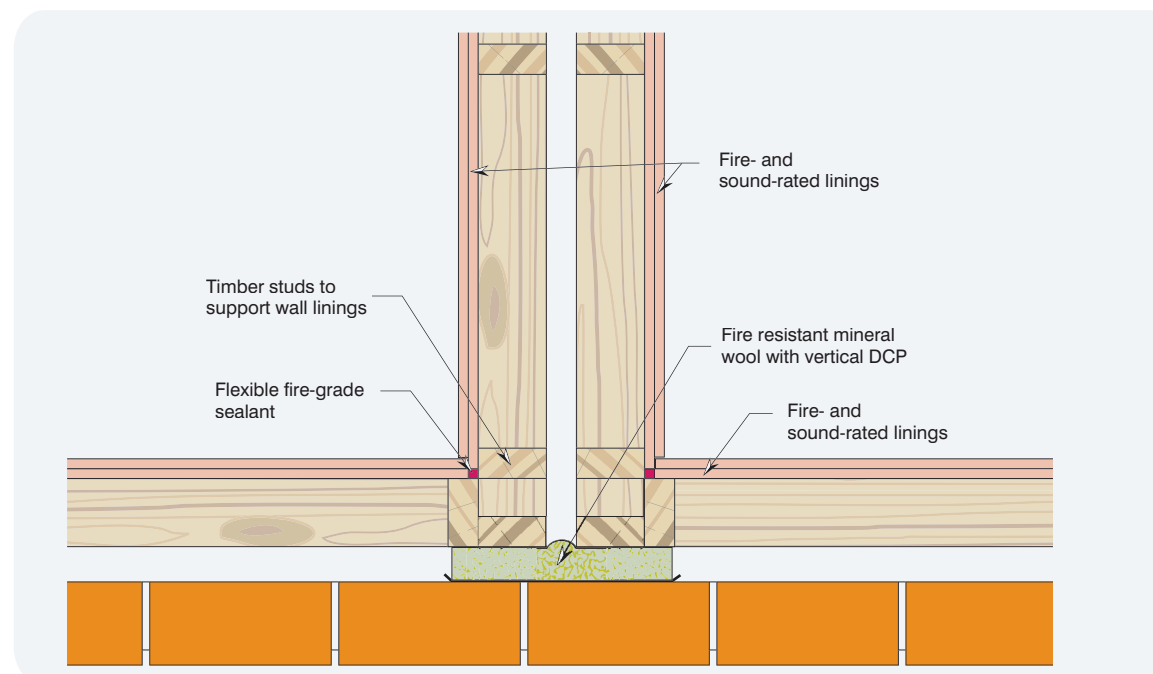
Typical junction of elements with the same FRL – fire-rated bounding wall abutting fire-rated external wall – plan view.
